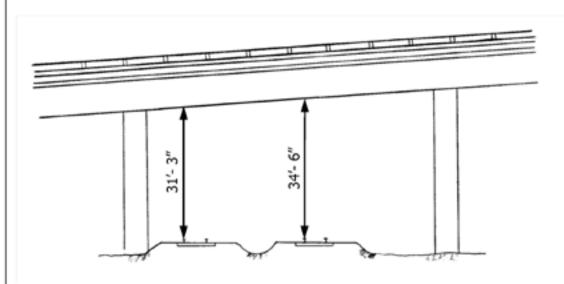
Bridge elevation view with two freight/passenger rail tracks below the bridge.
